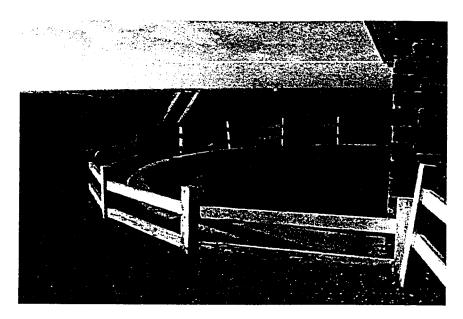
Storehouse retaining wall and Parade wall fencing looking northwest from southeast corner of Storehouse. Photograph by R. Hetzler, SUNY ESF, 2001.
